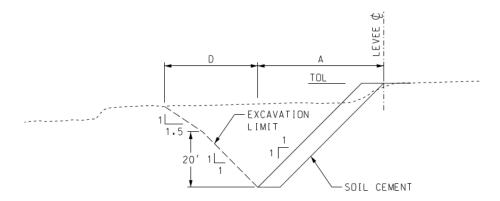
Typical Mitigation Section (Sta. 252+00, Stroube Drain, to Sta. 501+00, Central Avenue Drain)
